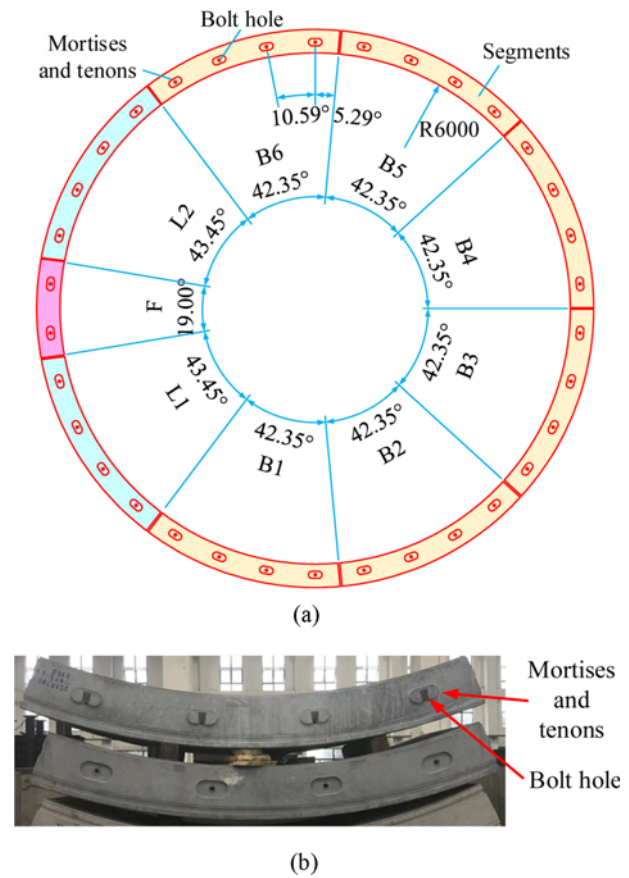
Segment Cross-Section Diagram of the Shiziyang Tunnel: (a) Segment Cross-Section Size, (b) Distributed Mortises and Tenons
